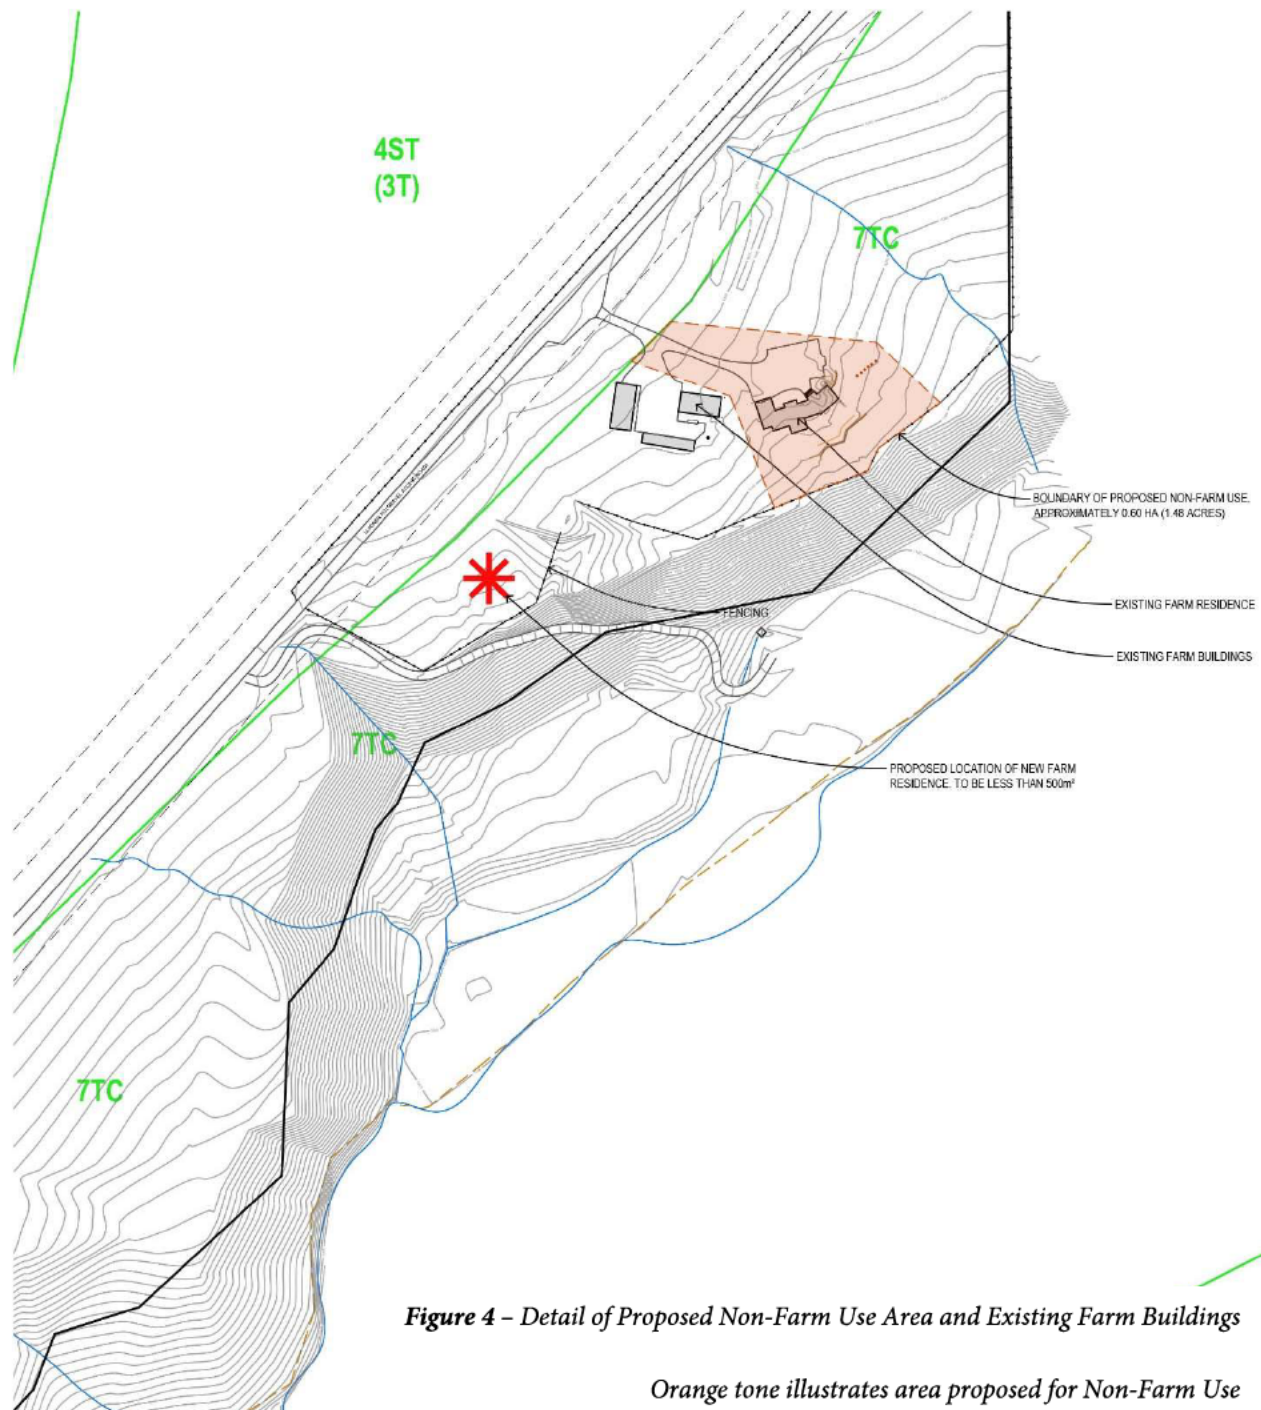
Detail of Proposed Non-Farm Use Area and Existing Farm Buildings
